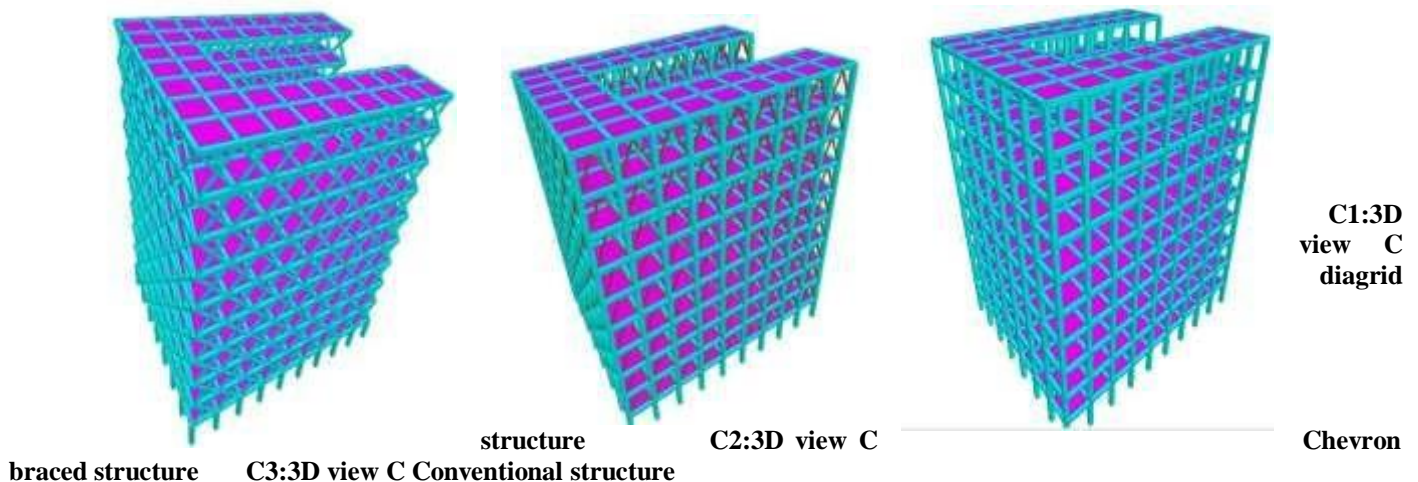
3D Rendering view of C Base plan structures in STAAD Software
